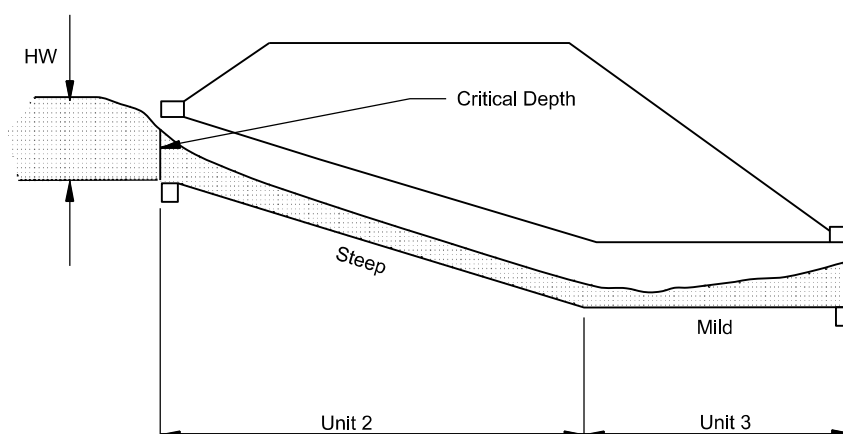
B — TWO-UNIT BROKEN-BACK CULVERT
